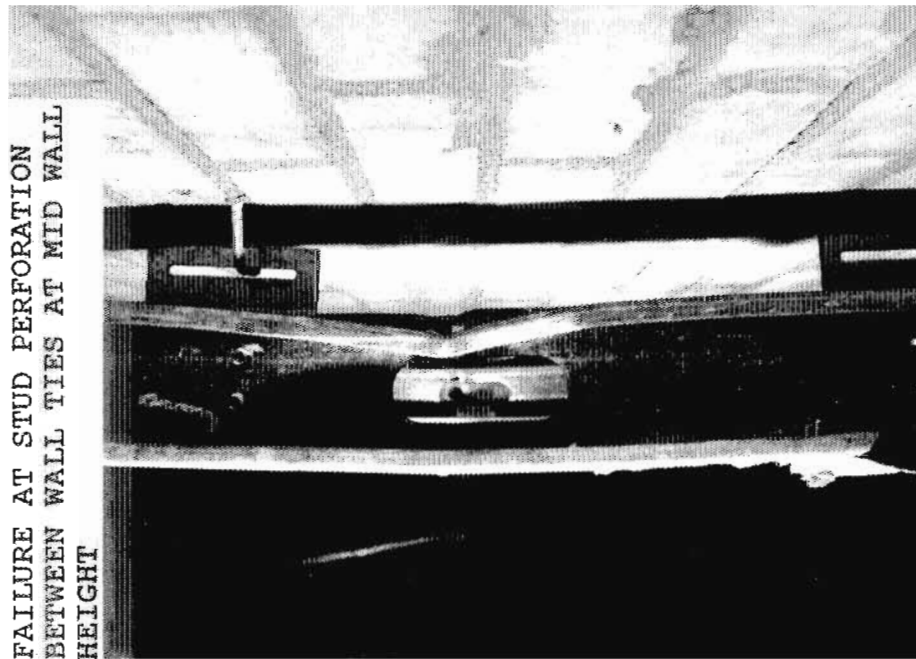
CONDITION OF WALL TIE AFTER FAILURE -
